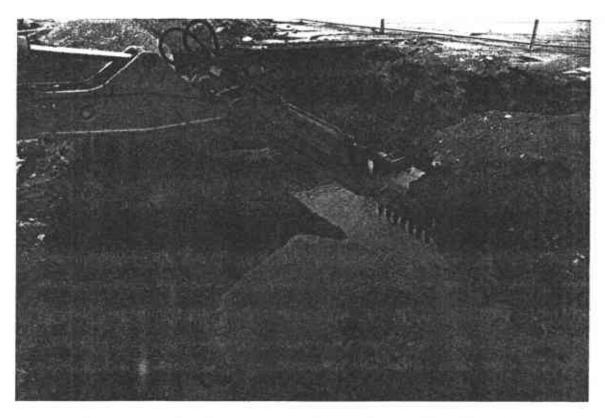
Removal of Tank No. 1 (Nearest to Building)
